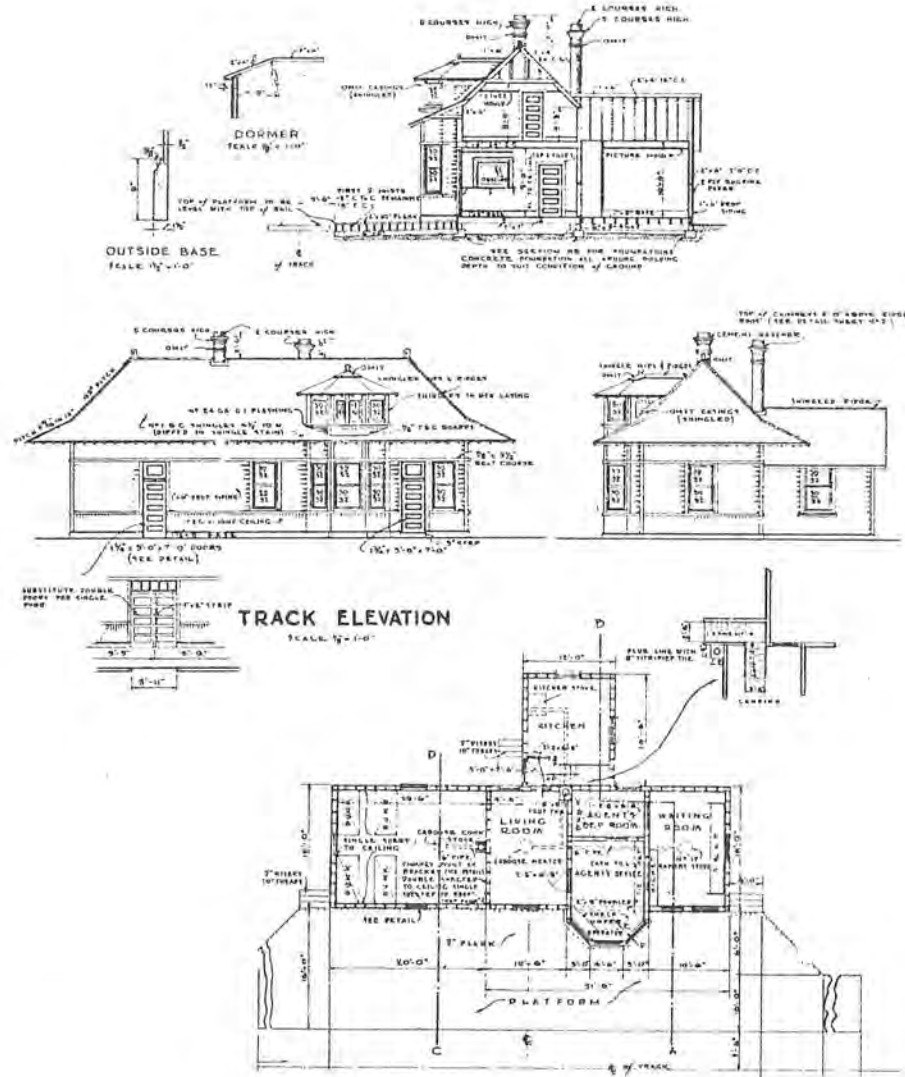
Grand Trunk Pacific Type E station plan 100-152.<sup>14</sup>
